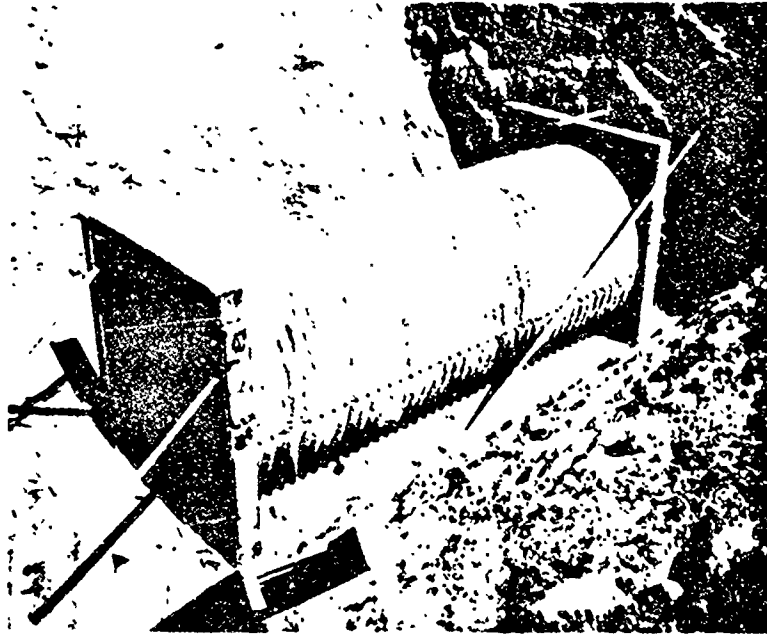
Exterior view of circular steel conduit prior to installation of access passage.
